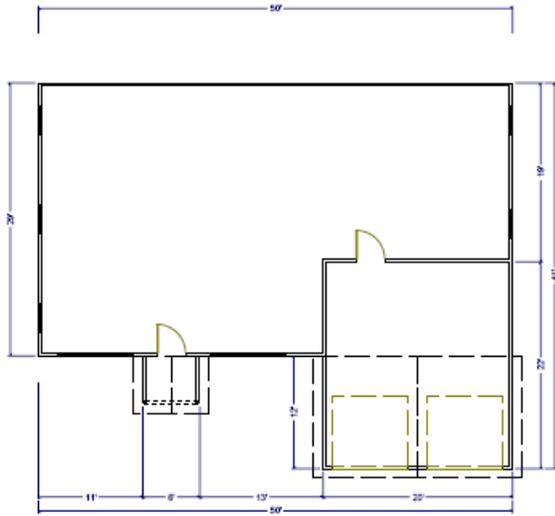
Two Story Prototype Floor Plan – 1<sup>st</sup> Floor
